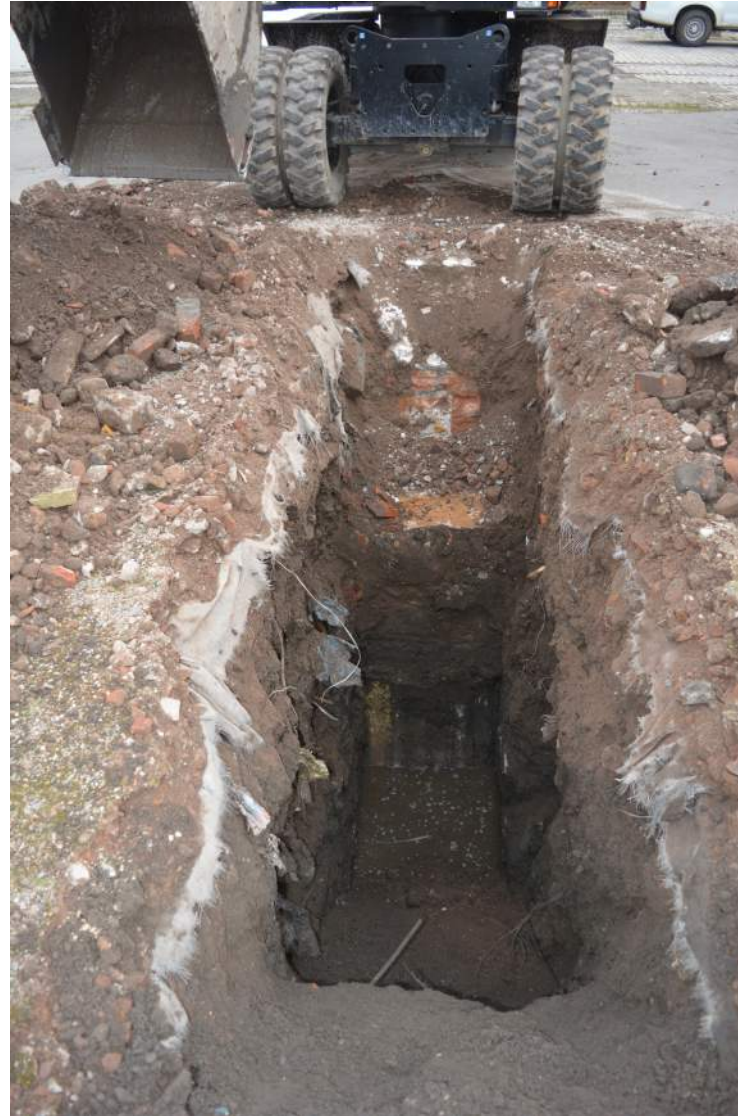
TT301/305. Retaining wall to Princes Dock after further excavation. View looking east. A scale could not be inserted.
